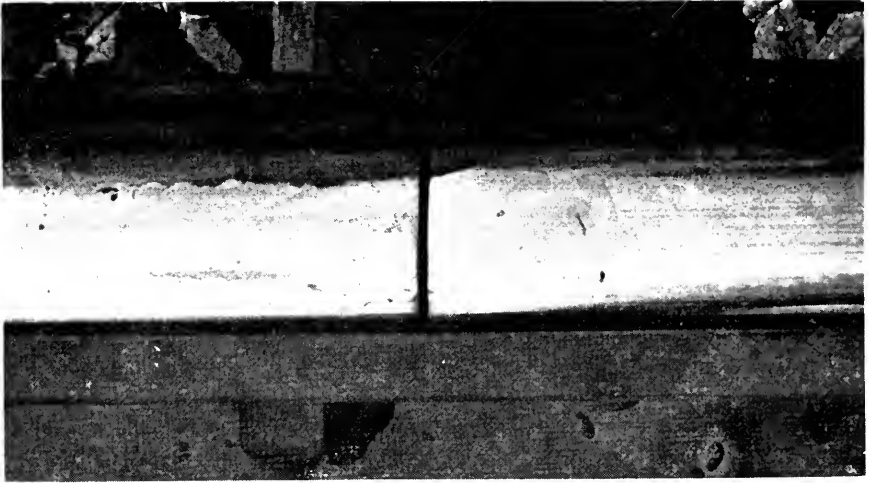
Photograph of joint 6 showing a transverse crack in the weld metal of the east rail and longitudinal cracks in the weld metal on the gage side of the west rail.
